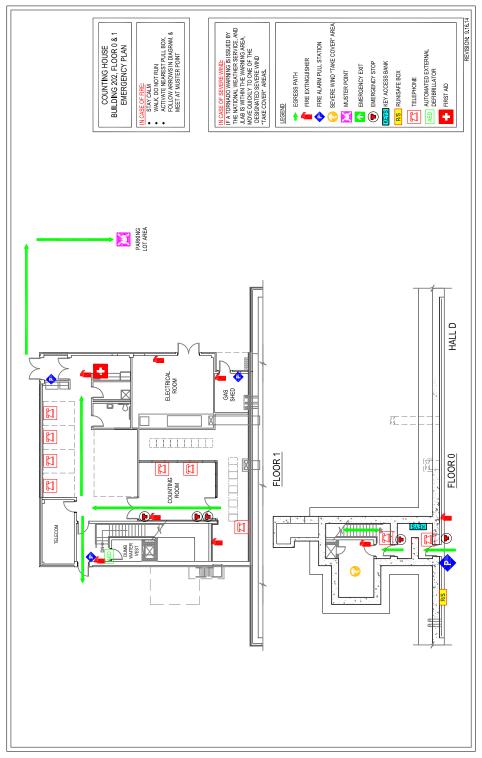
Layout of the Hall D experimental hall indicating safety equipment and emergency plan.
